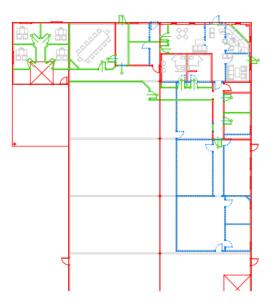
Conceptual Demo Floor Plan with New Structures - Structures to remain highlighted red, structures to be demolished highlighted blue, new structures highlighted green.
